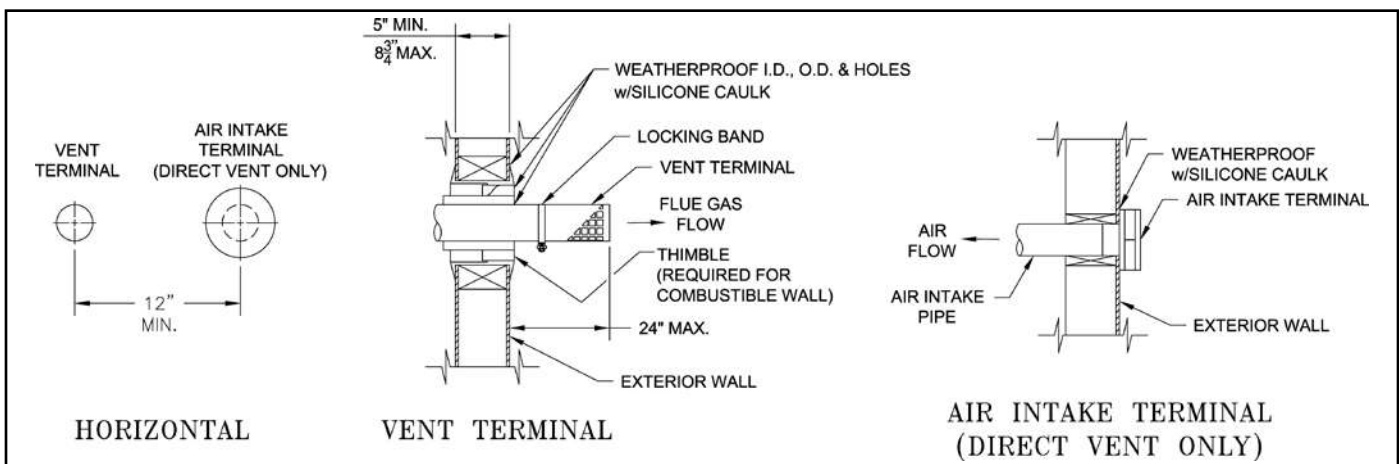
Separate Horizontal Air Intake Terminal Installation
